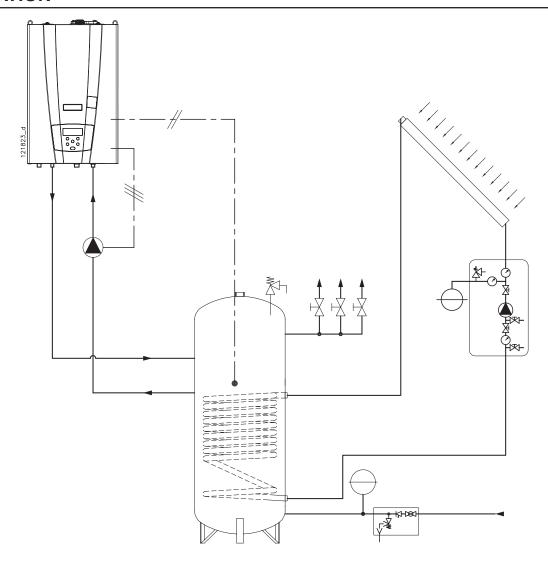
Example of installation with solar panel and storage tank (see section 5.13)
